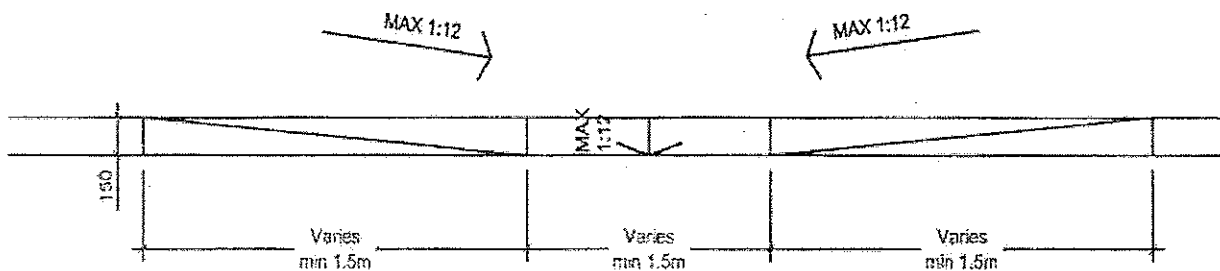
DRIVEWAY ACCESS CUT
